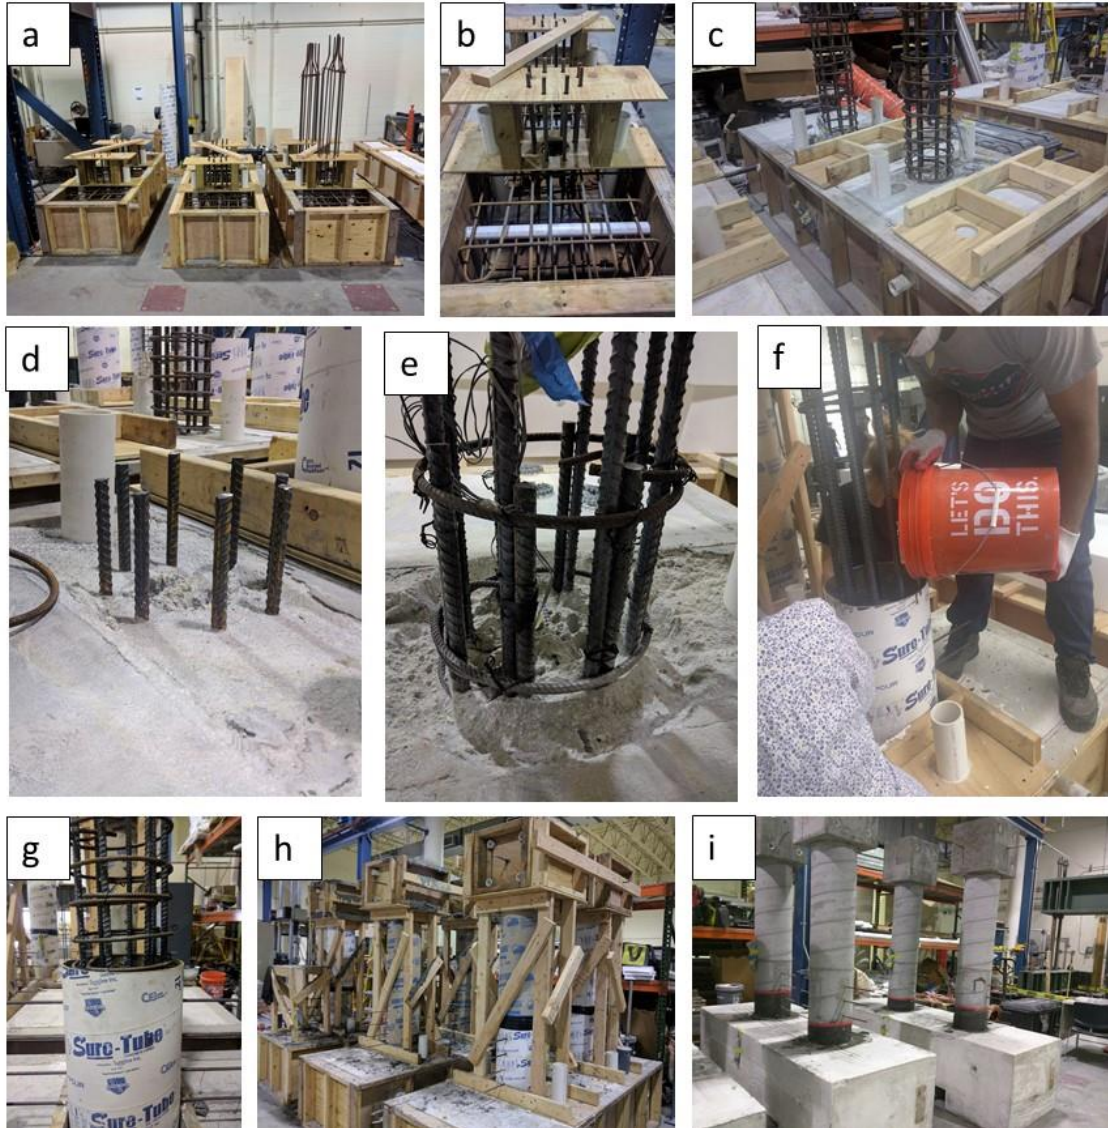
Specimen construction procedures a&b) Formwork of the supports, c) Casting supports, d) exposed rebar, d) Splicing rebar and sand blasting, f) Casting UHPC, g) Placing column stirrups, h) Casting column, and i) Removing formworks.
